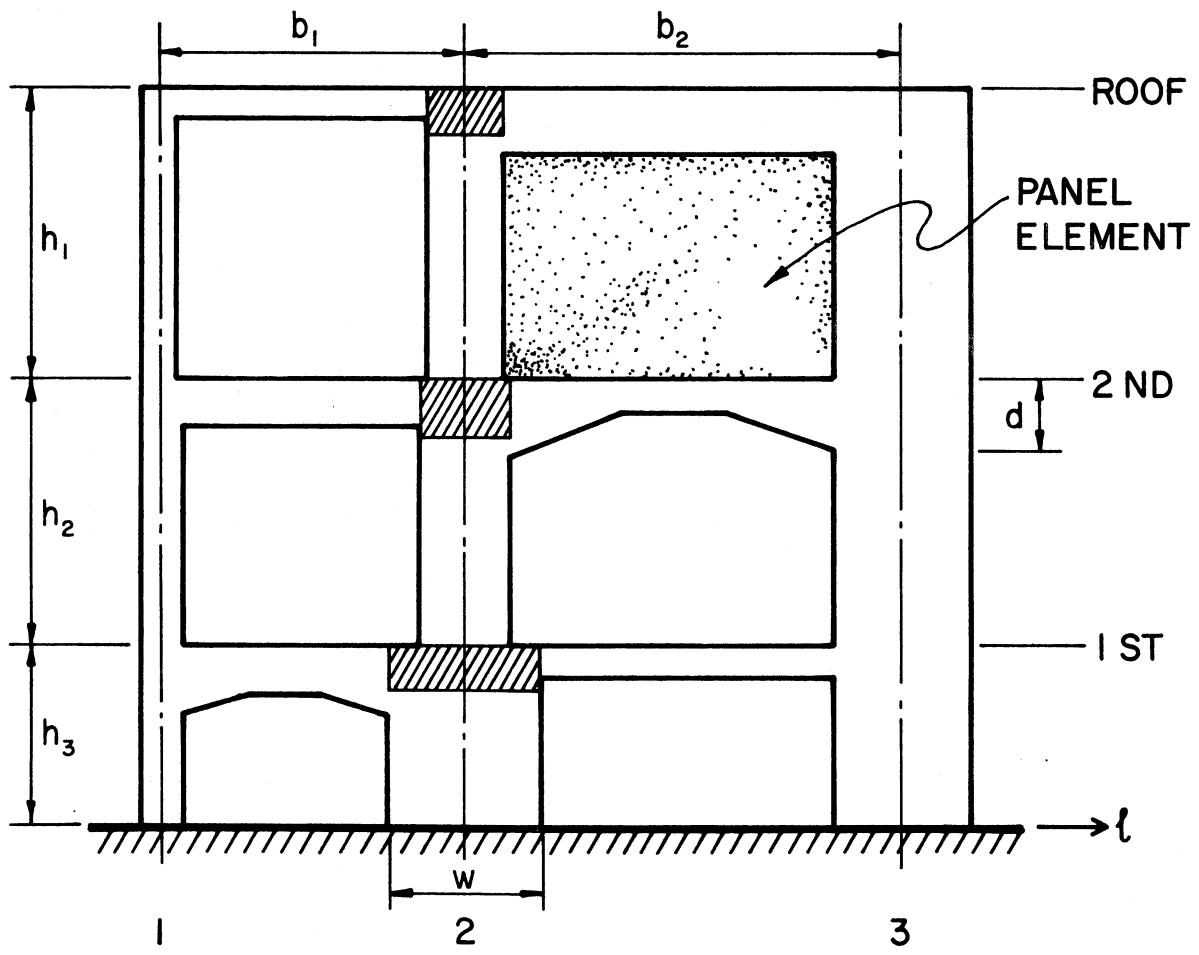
ELEVATION VIEW (TYPICAL FRAME)
